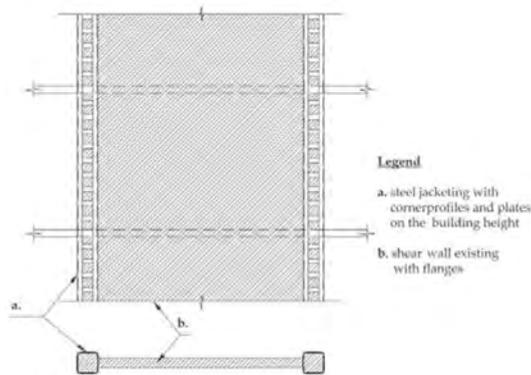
Strengthening solution for structural walls, with steel jacketing interventions on the edges (adapted after [34]).
